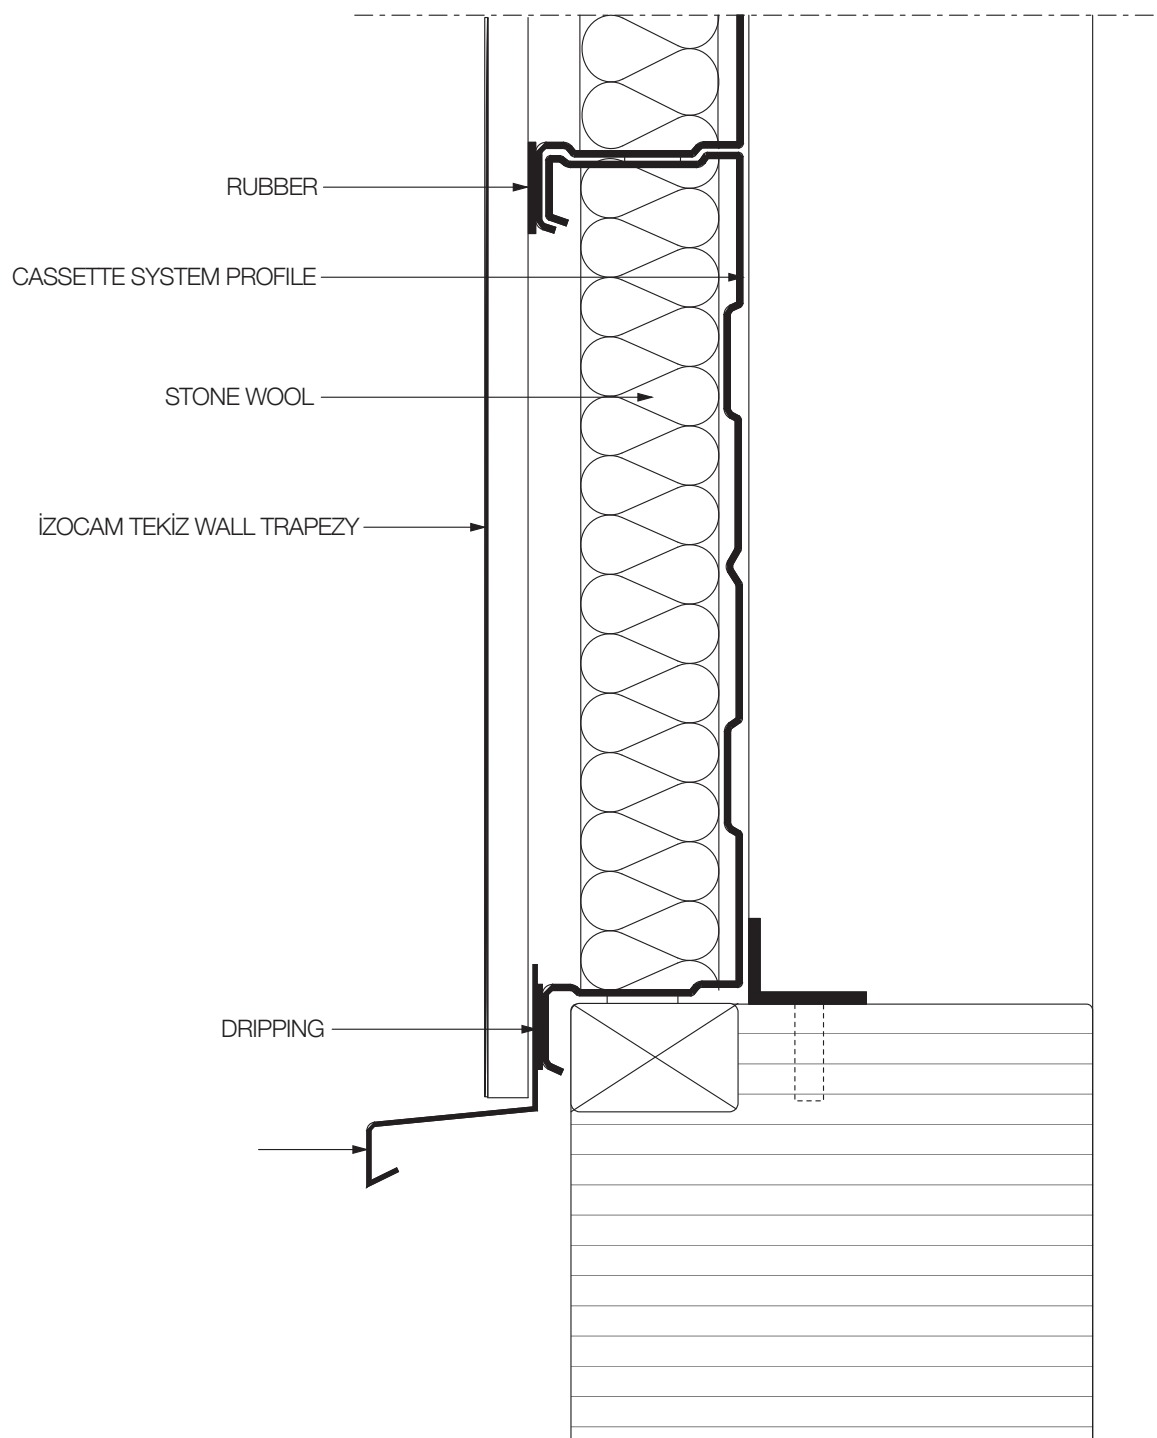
DETAIL OF DRIP WITH HORIZONTAL FACADE APPLICATION
